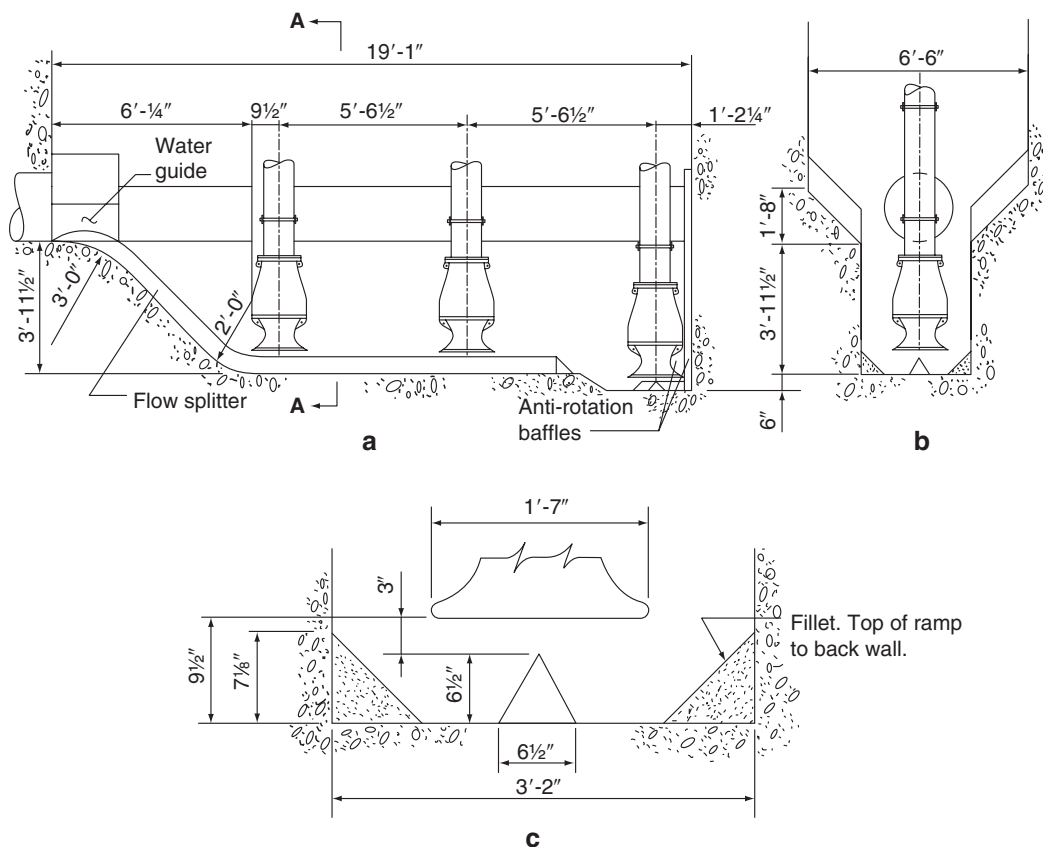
Wet well. Example 12-1. (a) Longitudinal section; (b) Section A-A; (c) detail of Section A-A.
